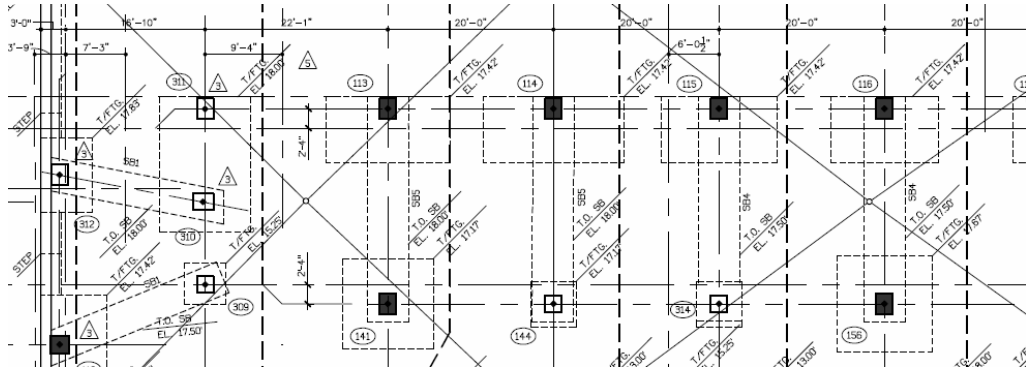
Foundation layout (incl. spread footings and strap beams)
